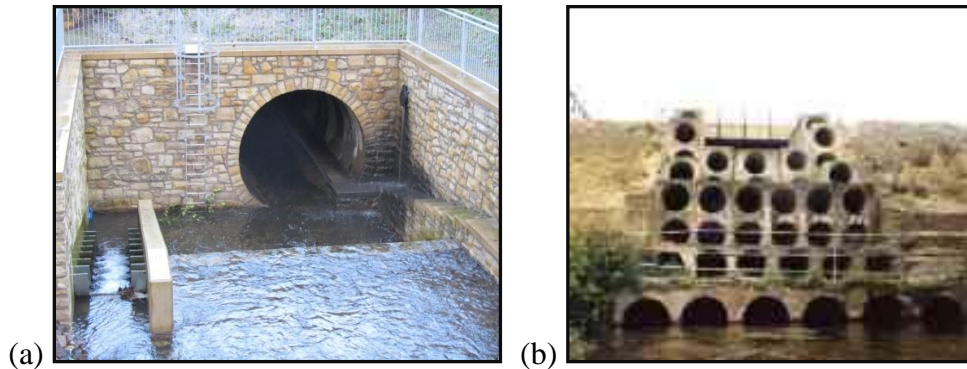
(a) Good culvert design (b) Poor culvert design (Image b from Benn *et al.*, 2004)
